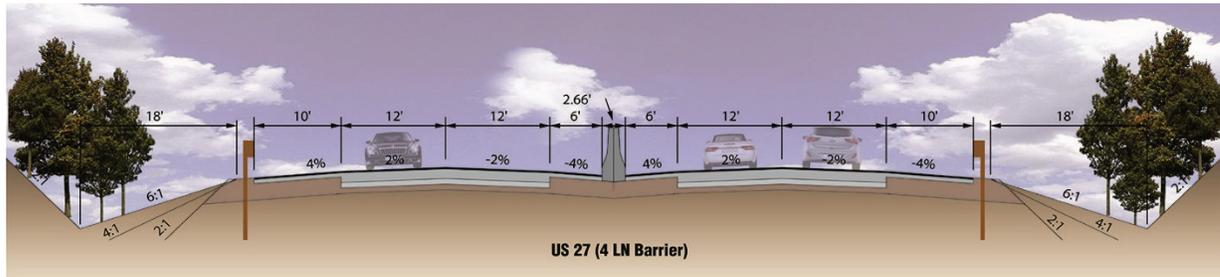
Typical Section 2 Four-lane with Barrier Wall (Alternative A5)
